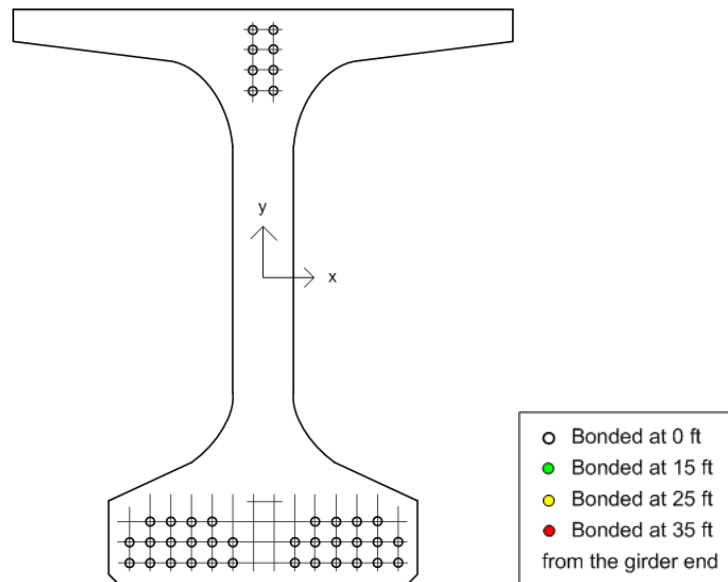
Girder cross section from the end showing the strand pattern, used in case DB 0.
